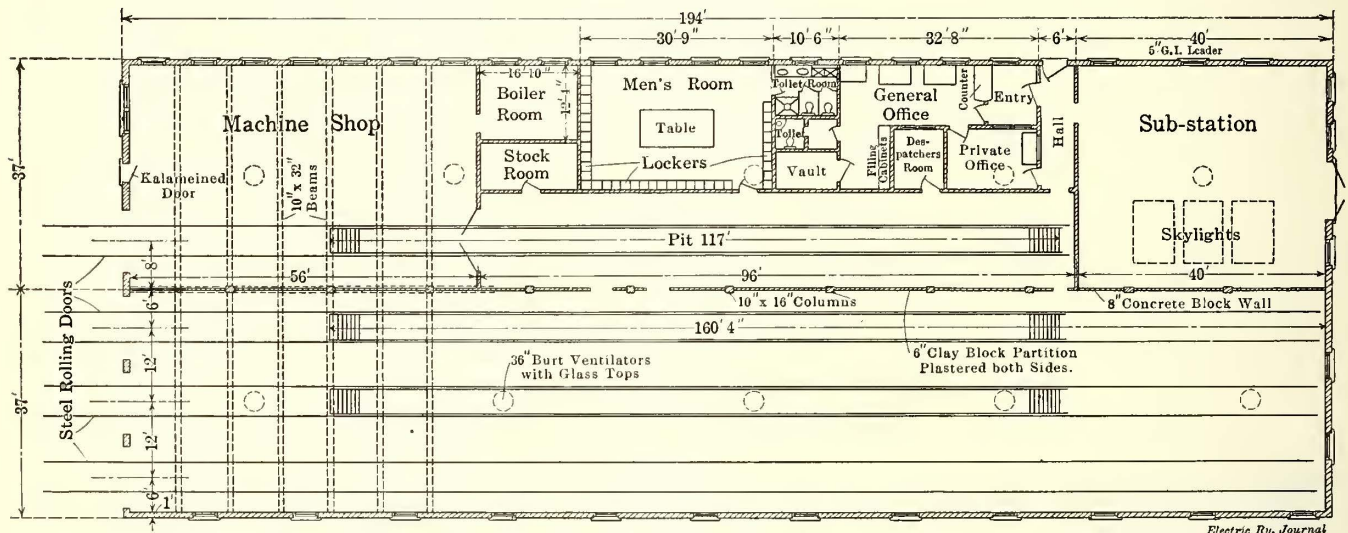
Shore Line Railway—Floor Plan of Carhouse at Saybrook
